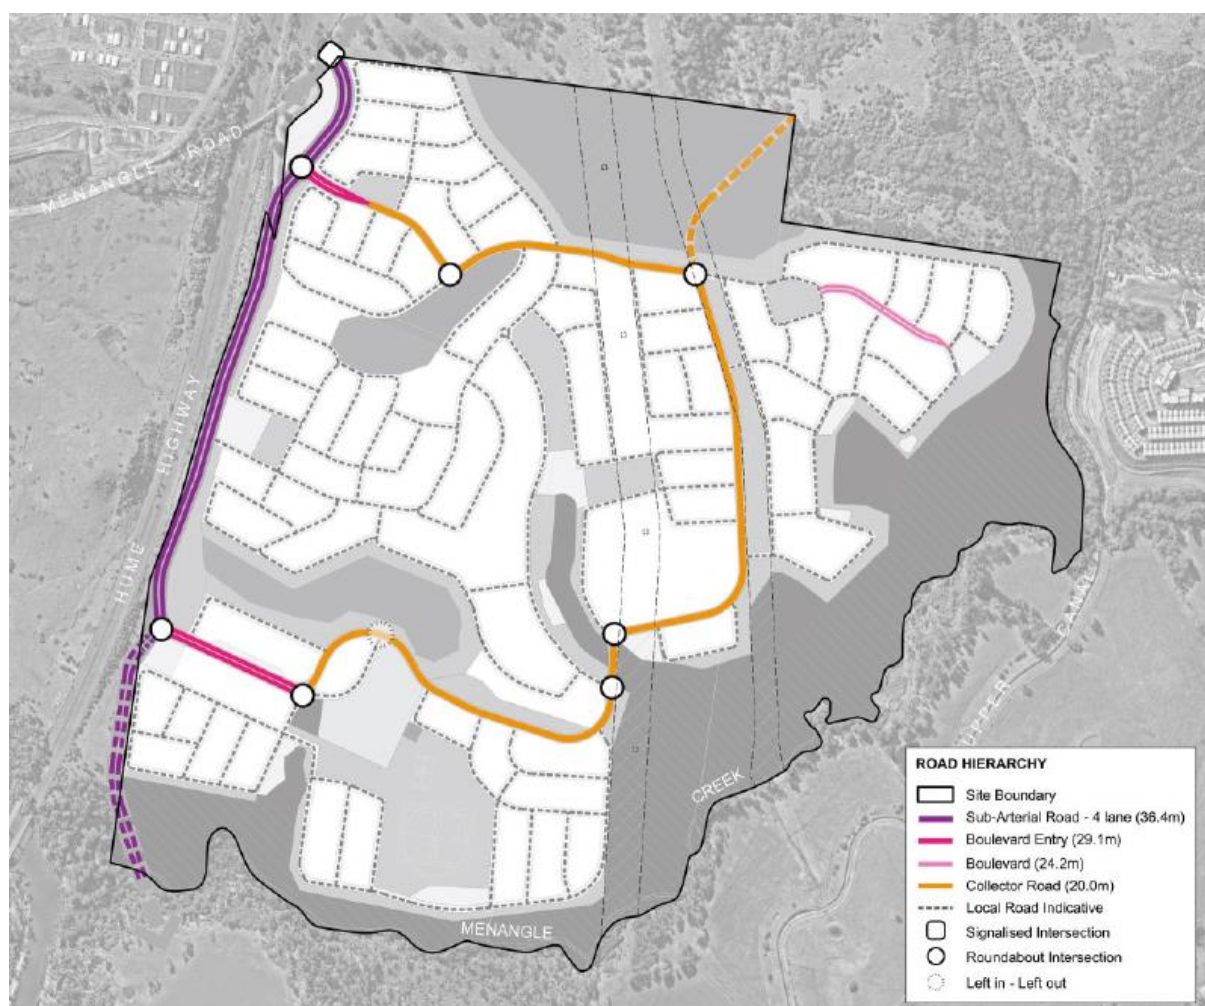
Road Hierarchy Plan (Source: Design + Planning)
